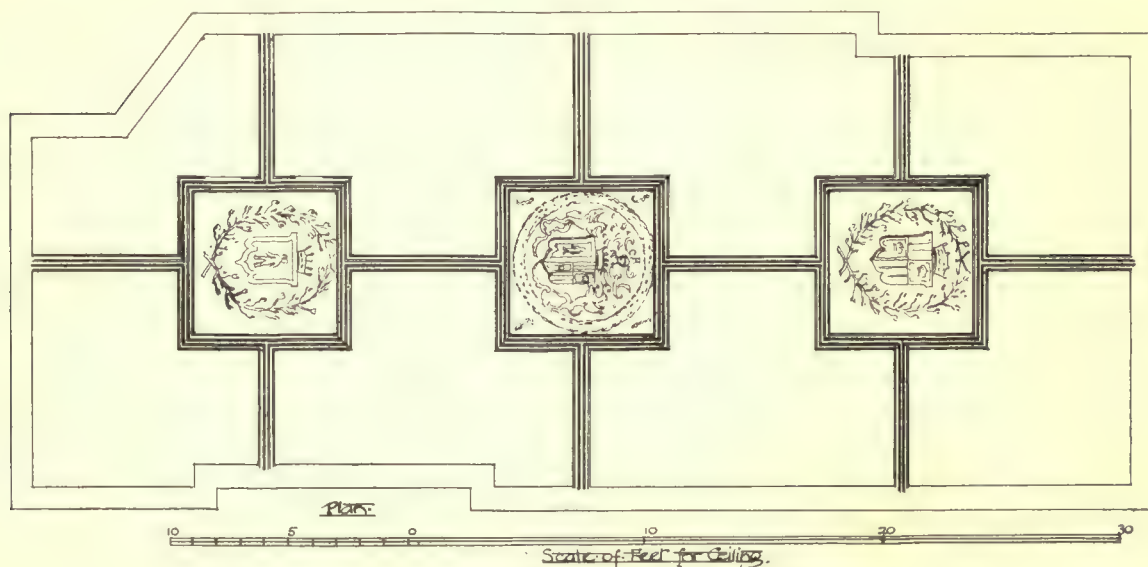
General View of Drawing-room Ceiling, Kellie Castle.
